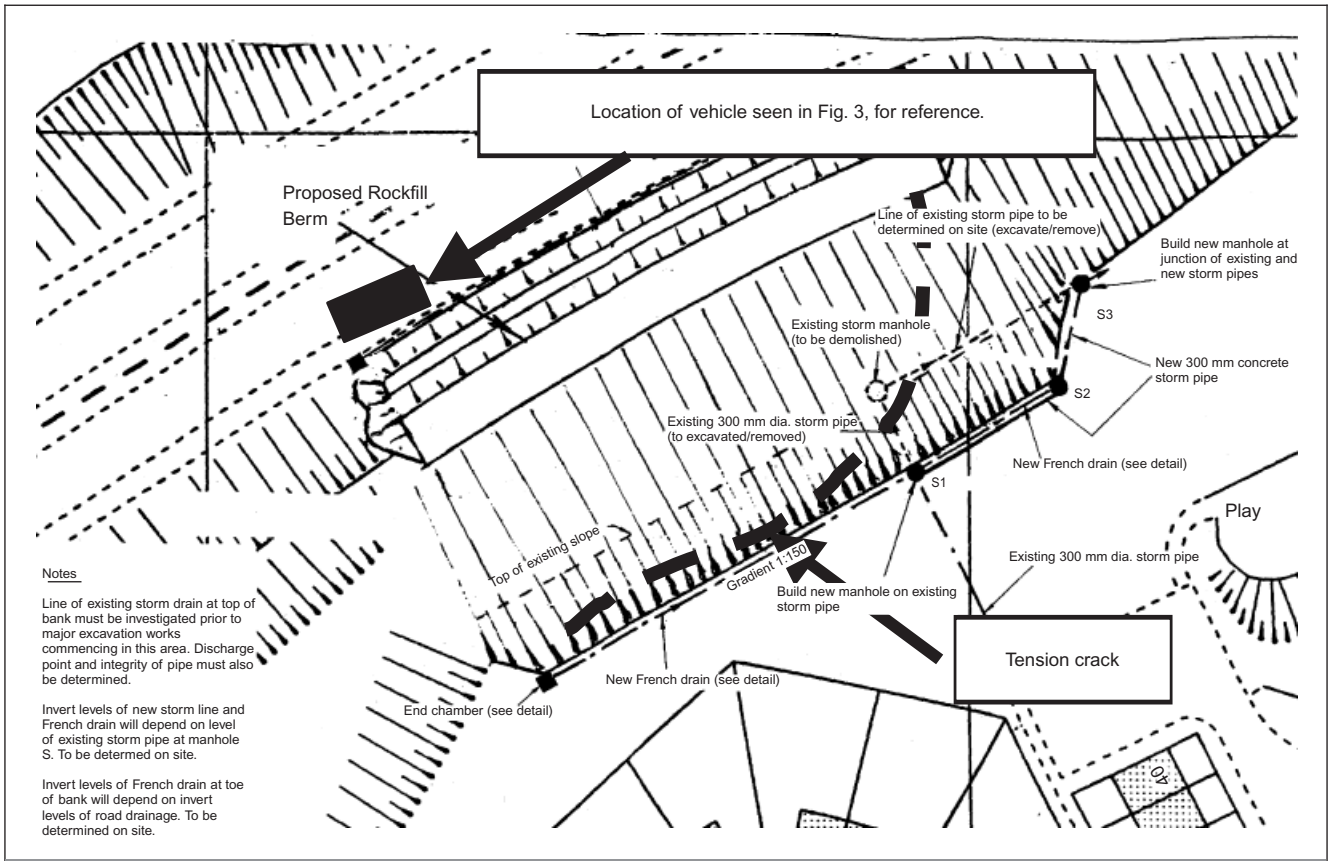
Plan drawing of temporary repair and location of tension crack (scale 1:20 000)
